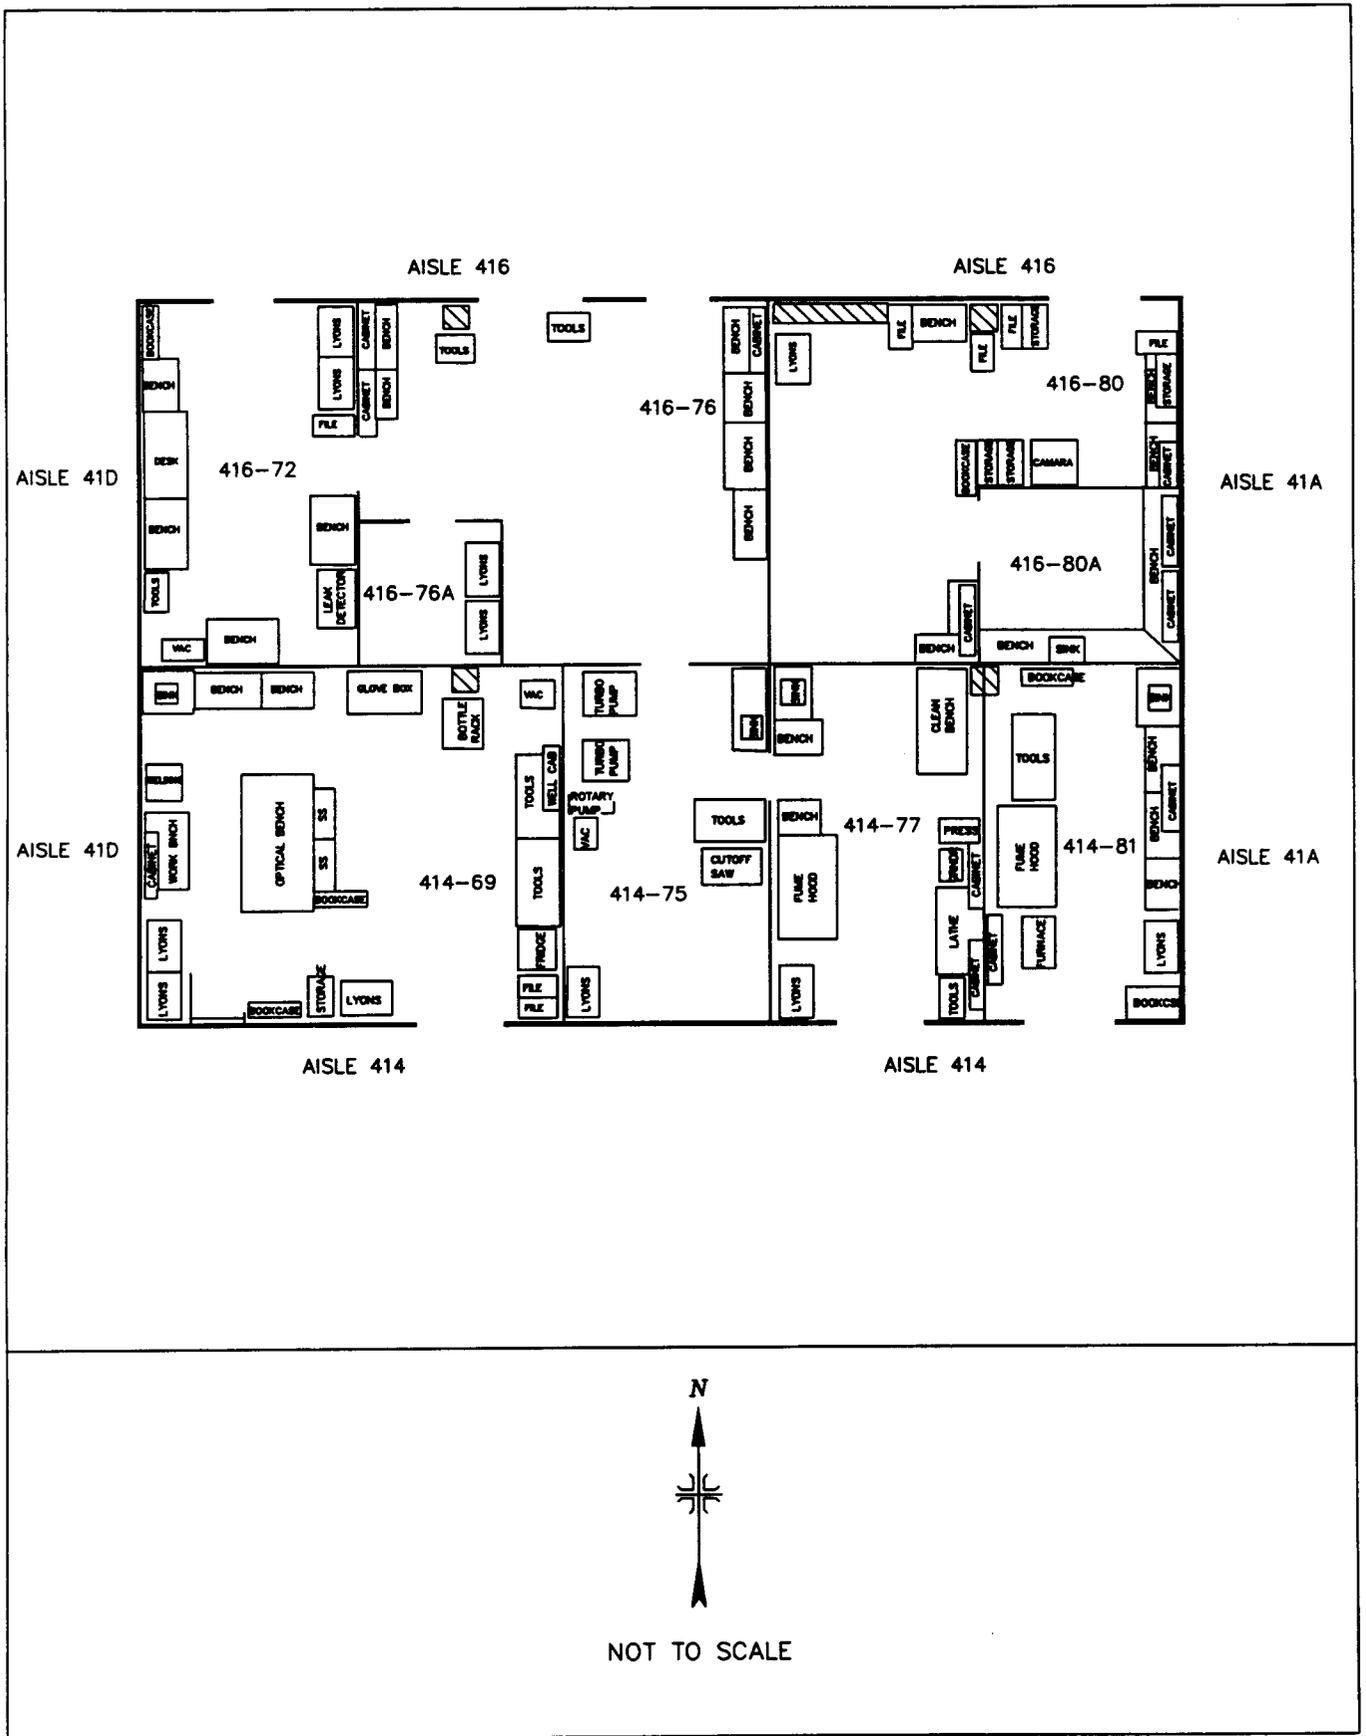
Mass Spectroscopy Laboratory – Original Floor Plan
